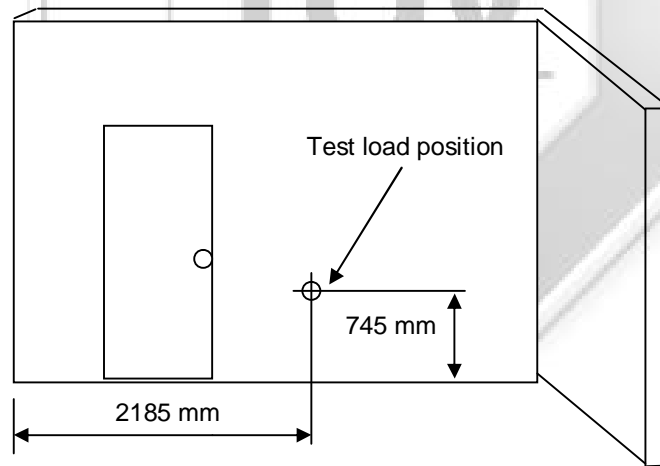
Locations of applied load for lightweight anchorage Pull-out test
